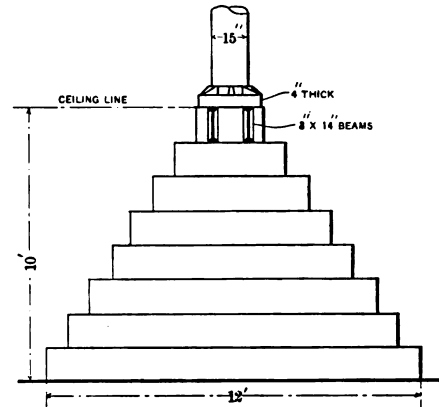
Elevation of One of the Foundation Piers of Chicago Opera House.
